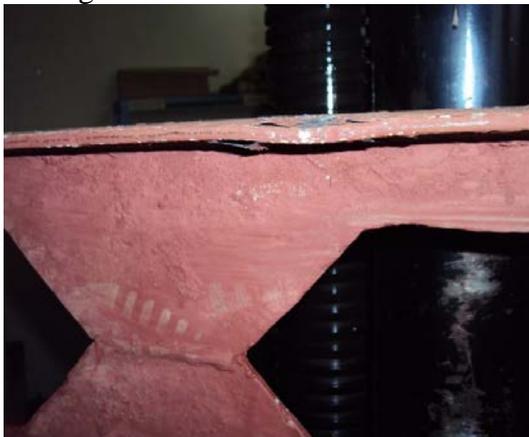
Local Failure Mode –Buckling of Compression Flange
